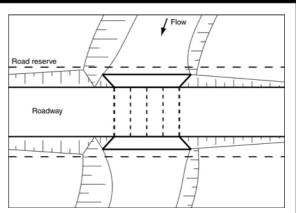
Stage 5: Finish construction of roadway and remove all sediment basins
